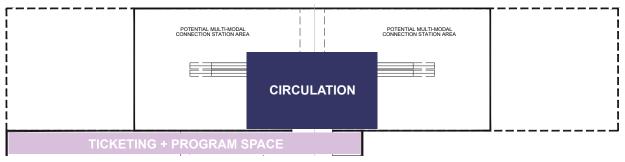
PLATFORM ACCESS PLAN VIEW - LEVEL 2
